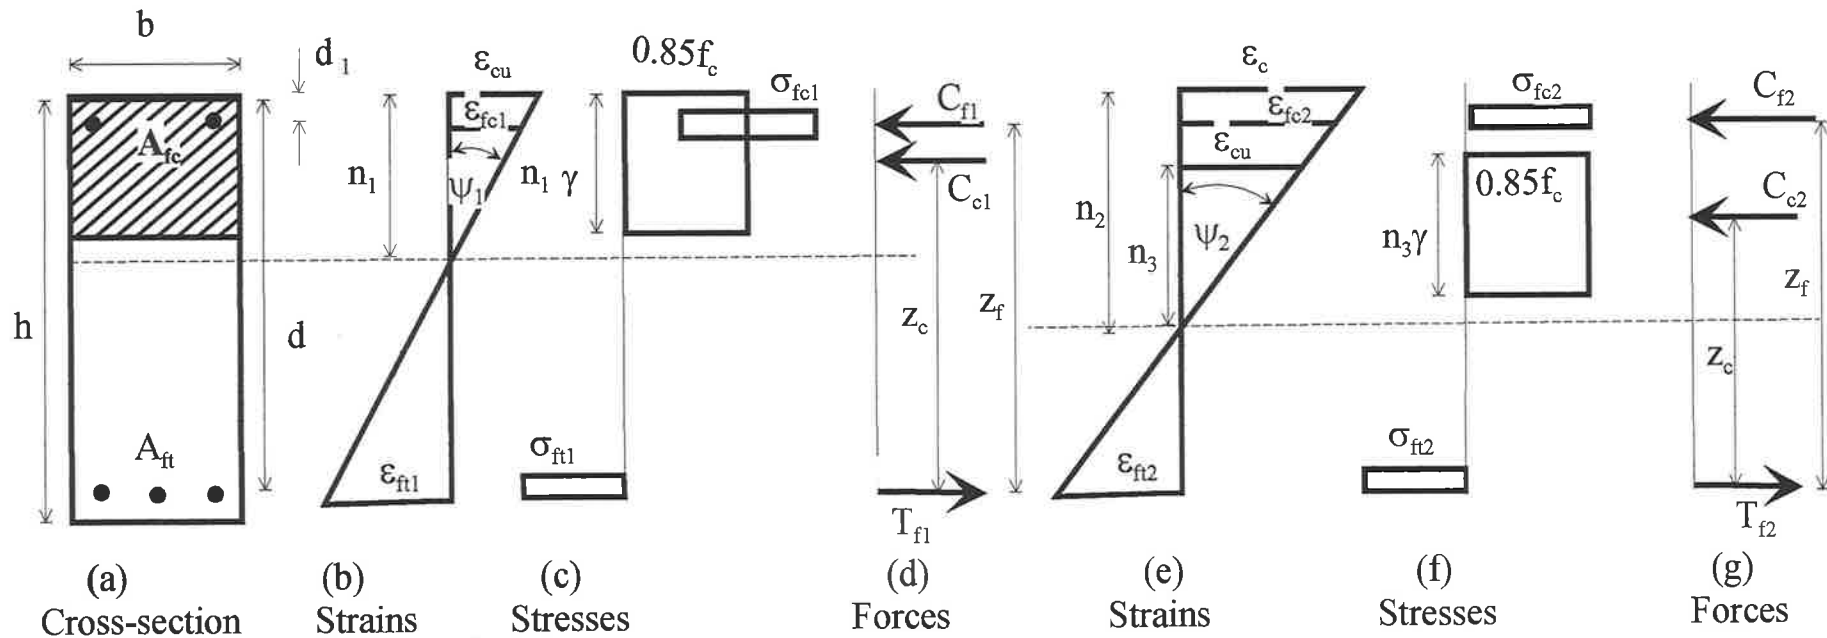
Doubly reinforced concrete beam with FRP reinforcing bars.
